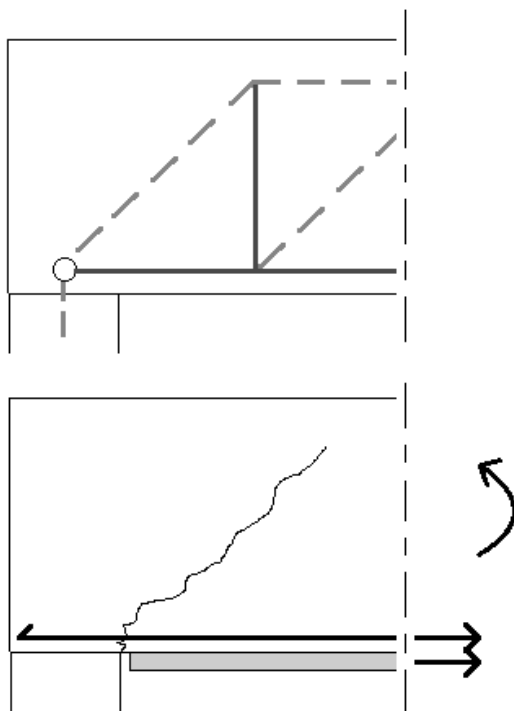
Anchorage of tensile members at simple support, a) strut and tie model before strengthening and b) anchorage problem when strengthening on the tensile side.
